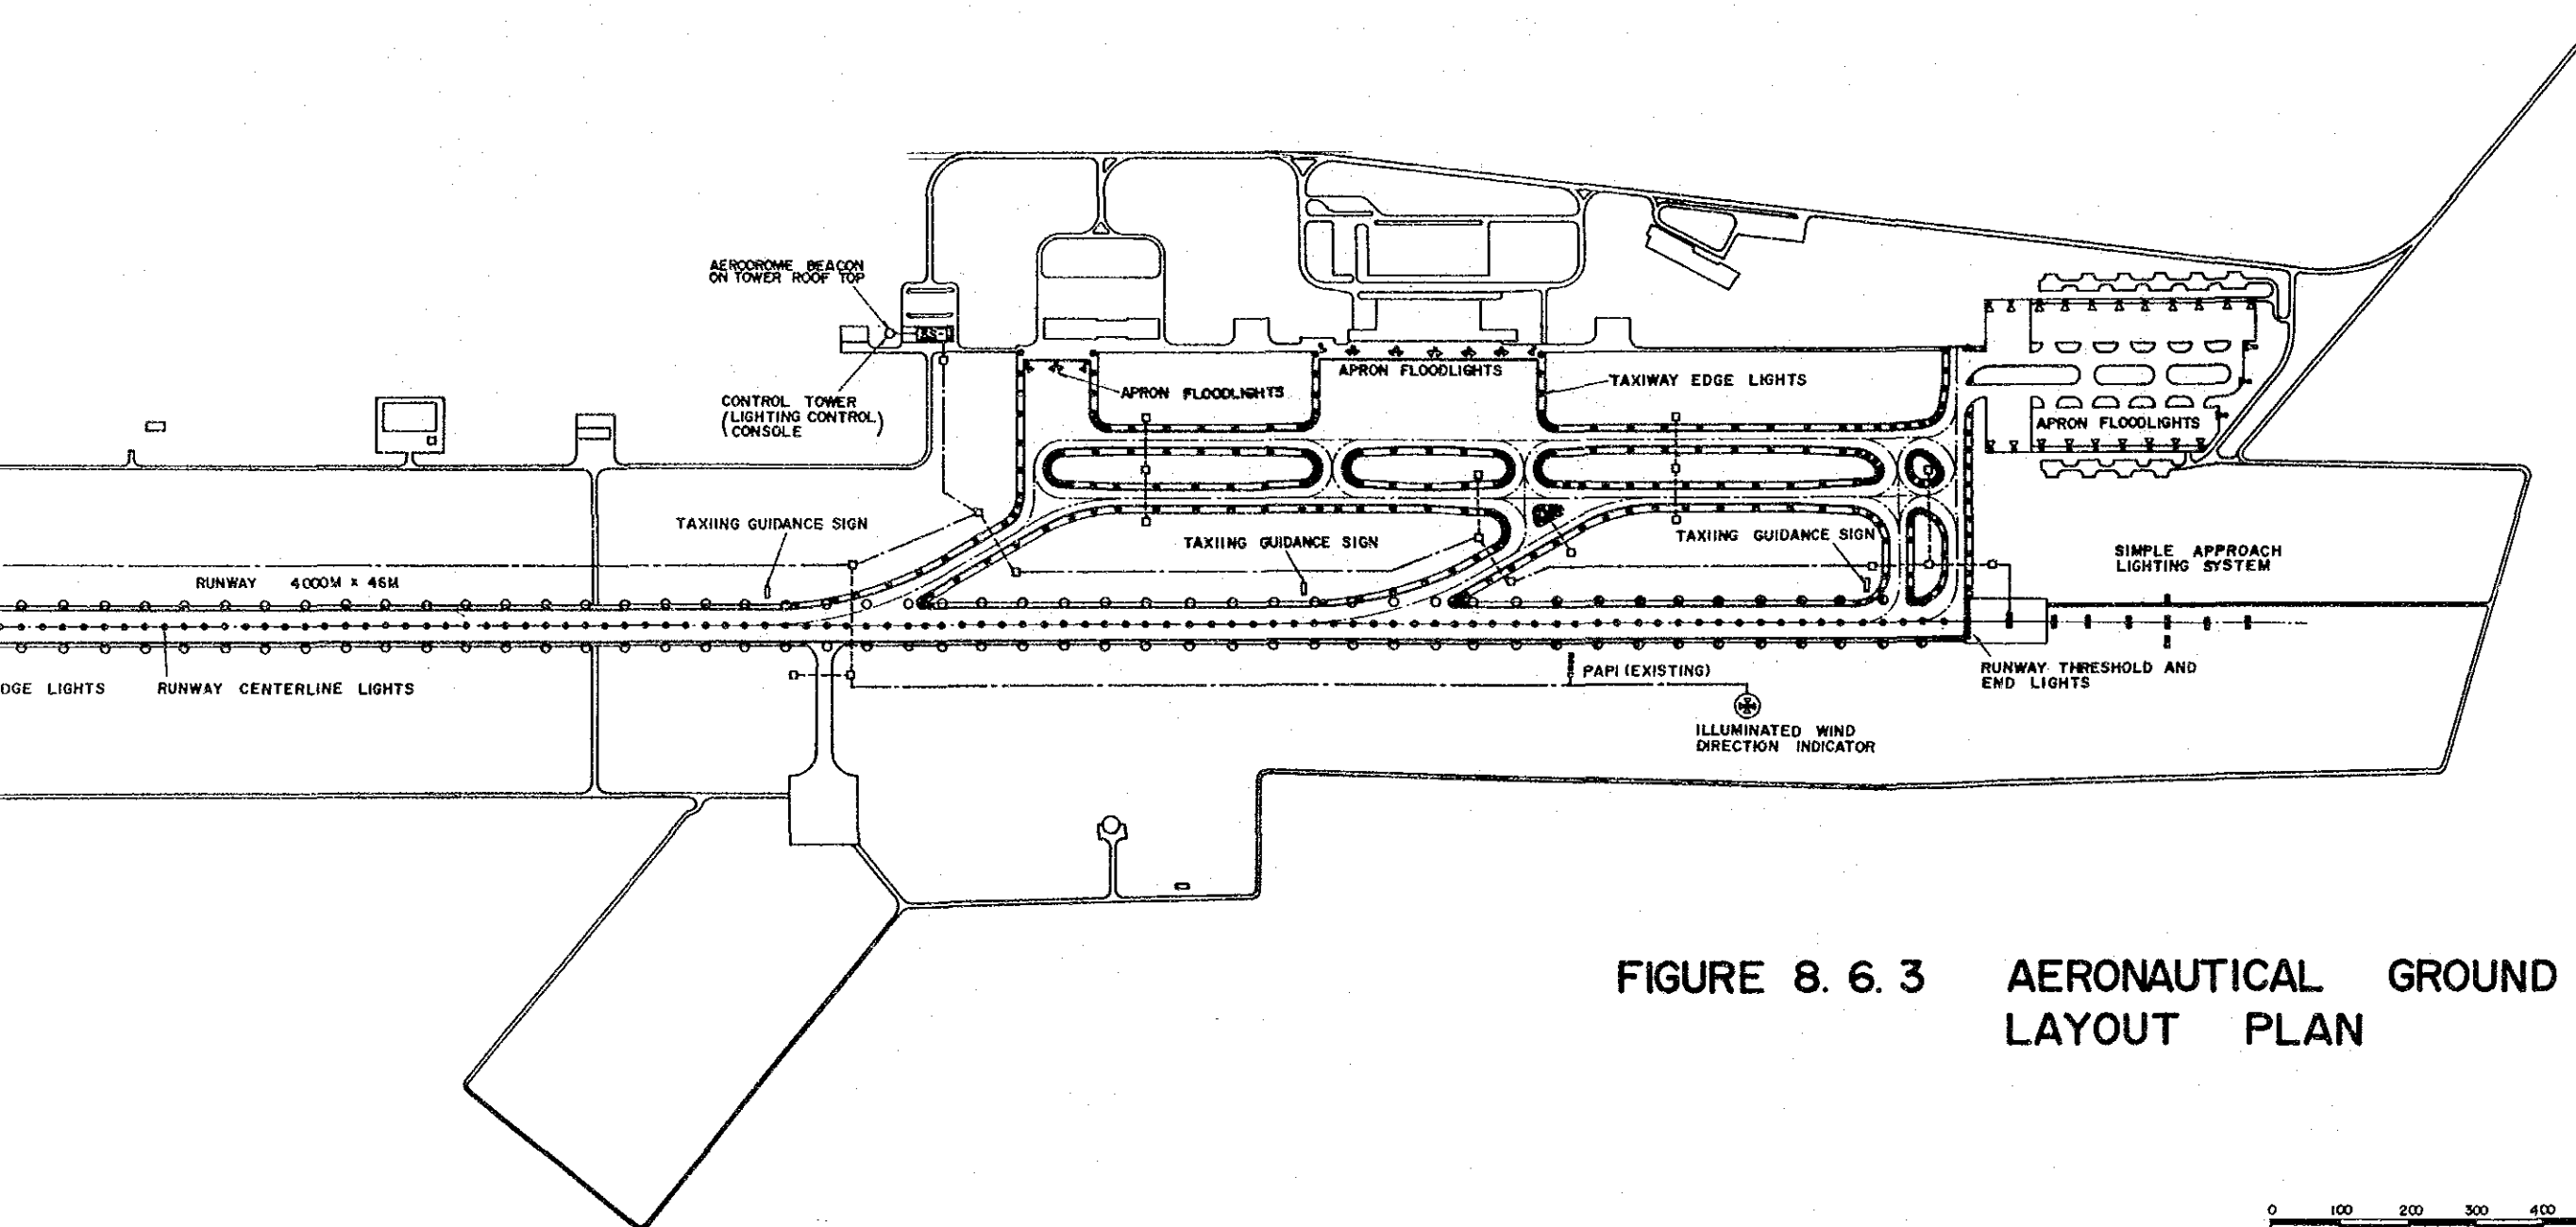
6. 3 AERONAUTICAL GROUND LIGHTS LAYOUT PLAN
